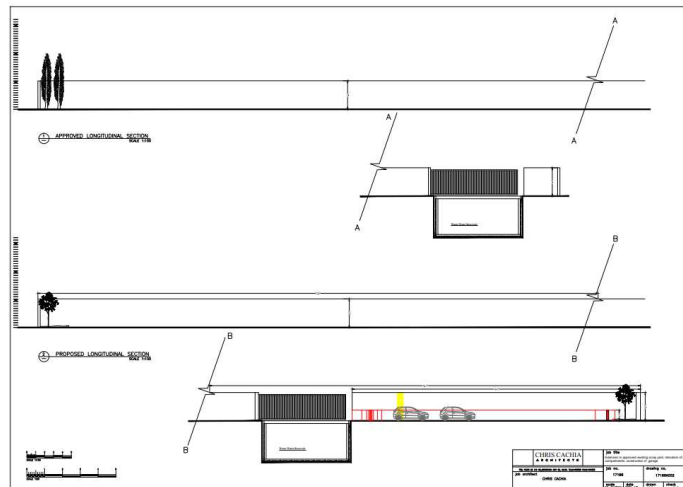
Proposed longitudinal section. Source: PA 3854/18/48b
